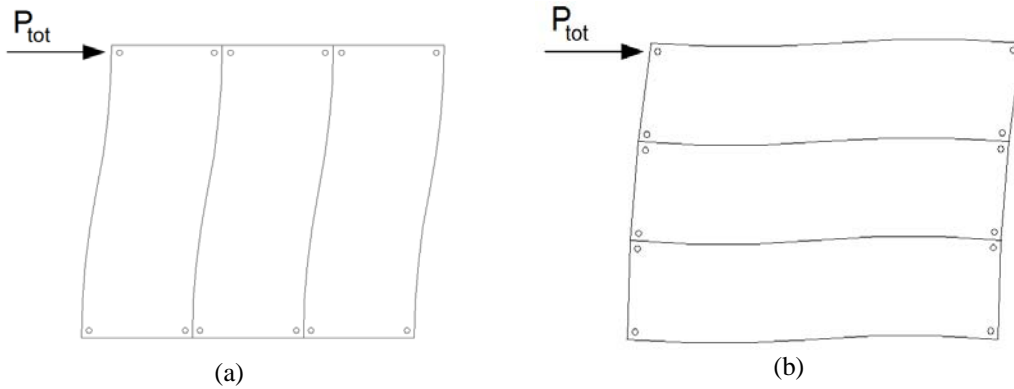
Typical deformation of panels with four fixed connections: (a) vertical panels connected to the beams; (b) horizontal panels connected to the columns.
